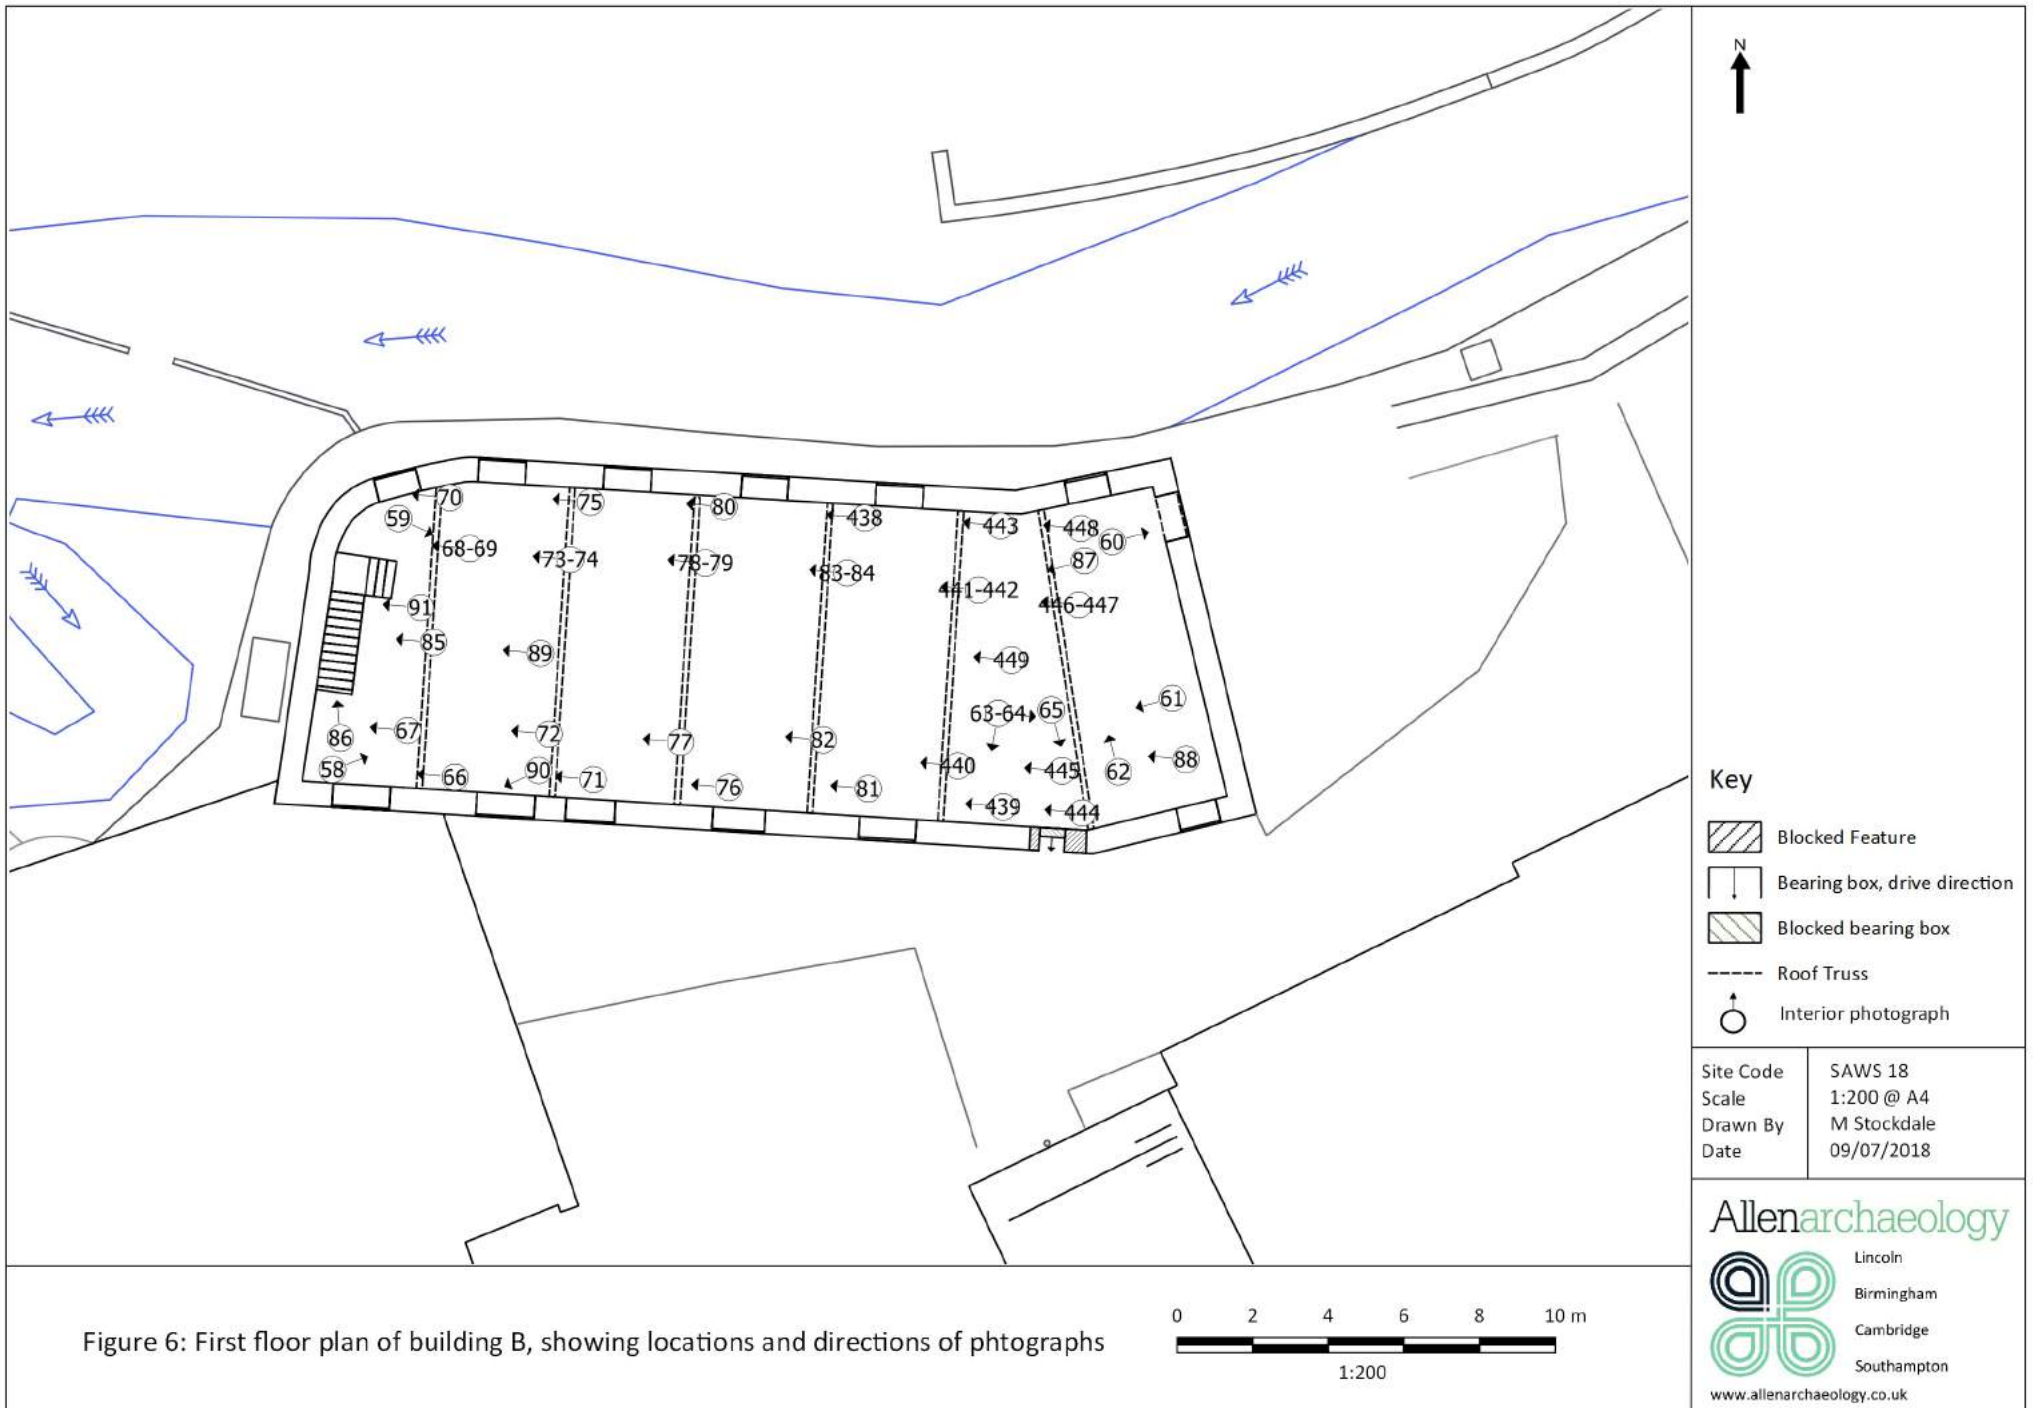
First floor plan of building B, showing locations and directions of phtographs
